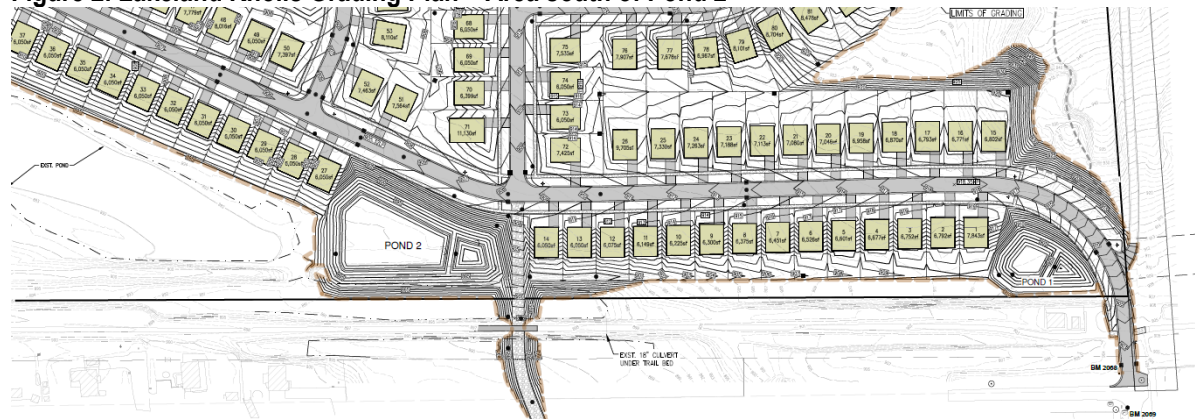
Lakeland Knolls Grading Plan – Area south of Pond 2
